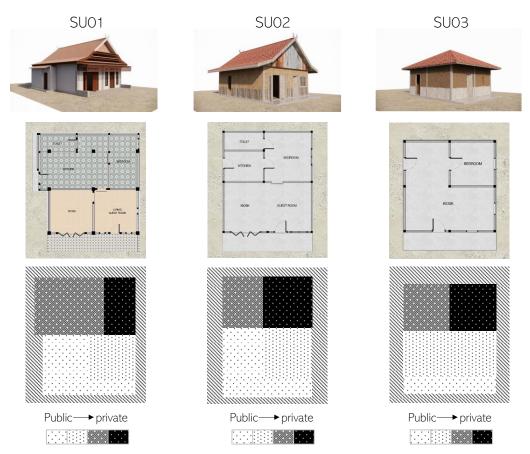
SU's houses in Kampung Air with 3D render, floor plan and layout analysis
